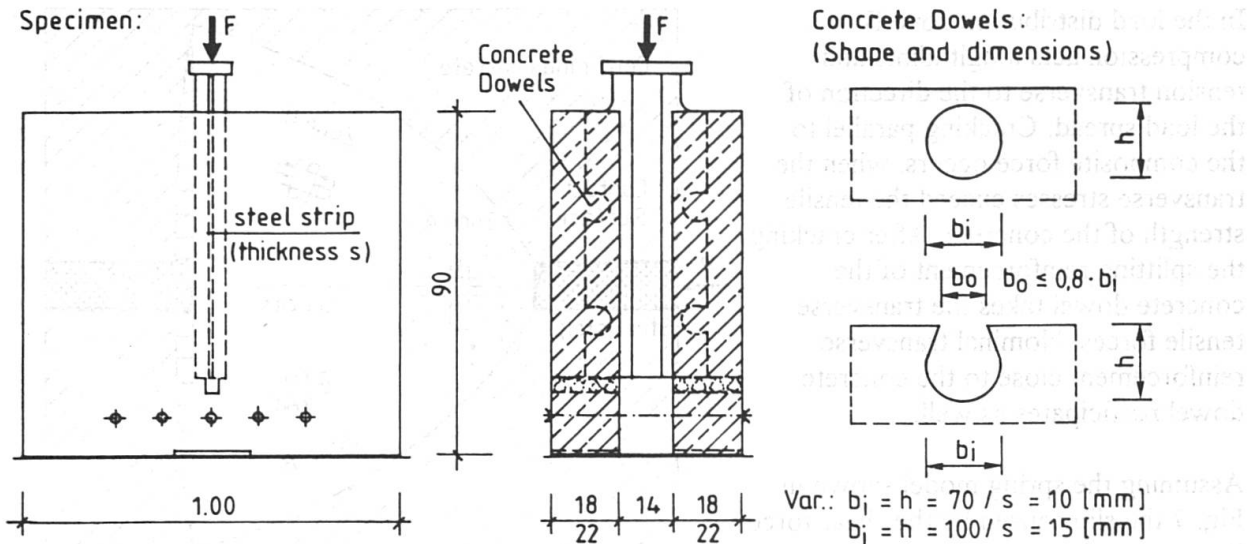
Push-out test specimen and investigated variants of Concrete Dowels
